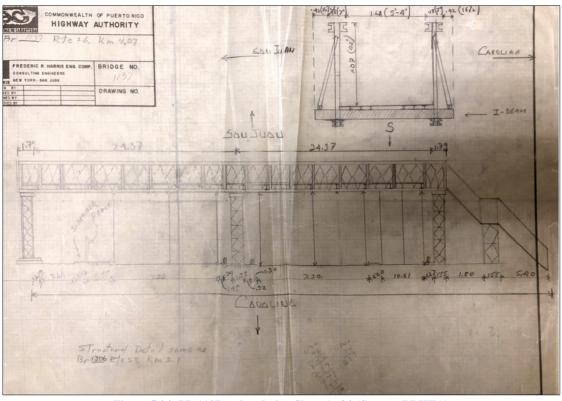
PB 1137 undated plan Sheet 1 of 2 (Source: PRHTA)
